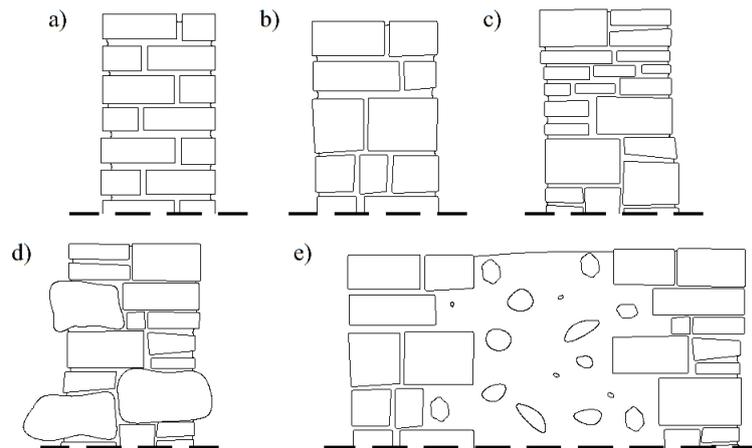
Selected types of the masonry walls in the ruins of castles - a) wall made of ceramic bricks, b) wall made of stone blocks, c) wall made of stone blocks with leveling layers, c) wall made of broken stones with boulders, d) the „opus emplectum” wall[1]
